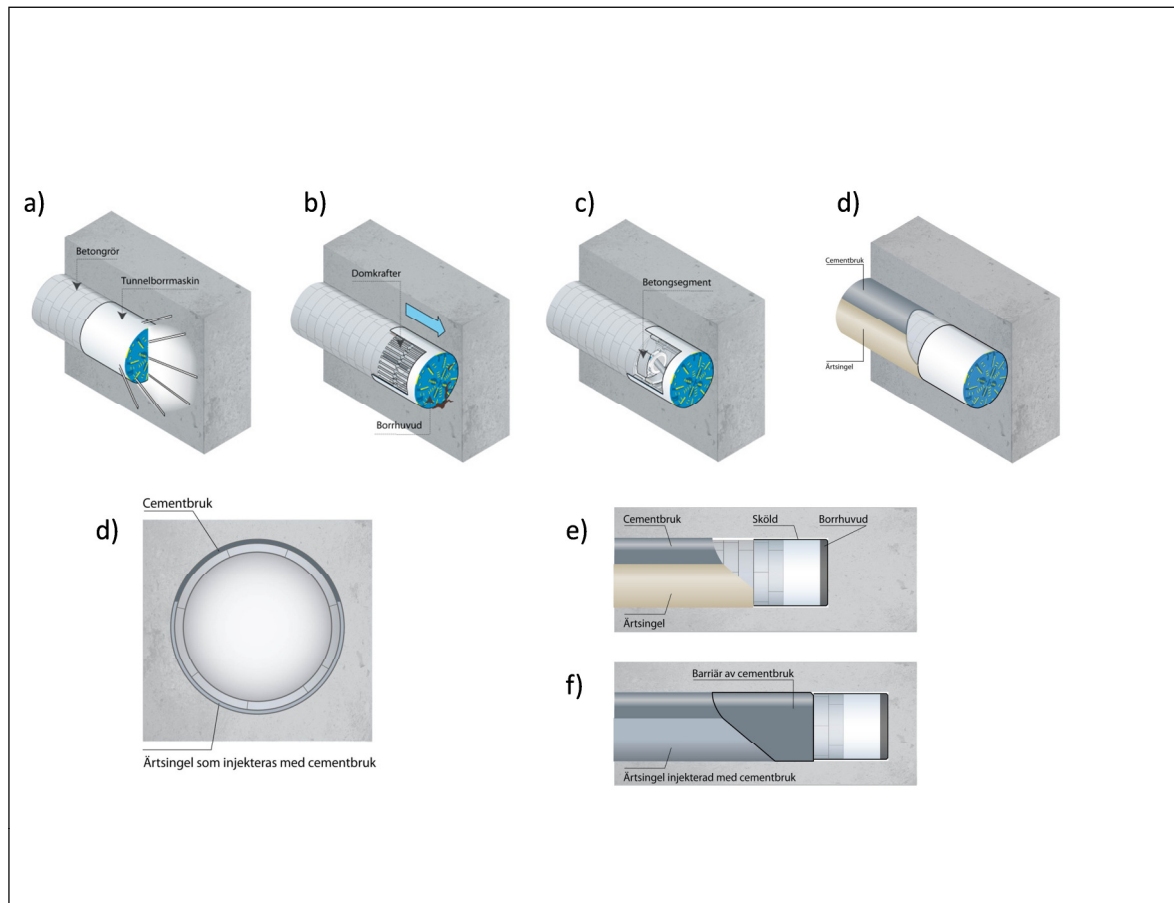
TBM production cycle. a) pre-grouting, b) progress, c) addition of new segment d) adding of gravel e) and f) grouting,
